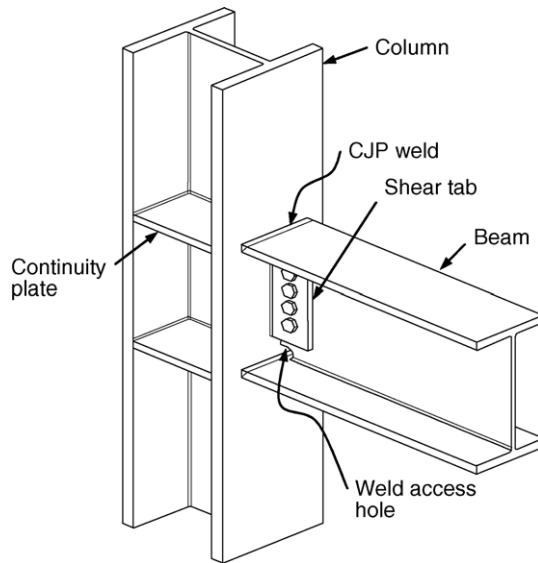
Typical pre-Northridge beam-to-column moment connection.
